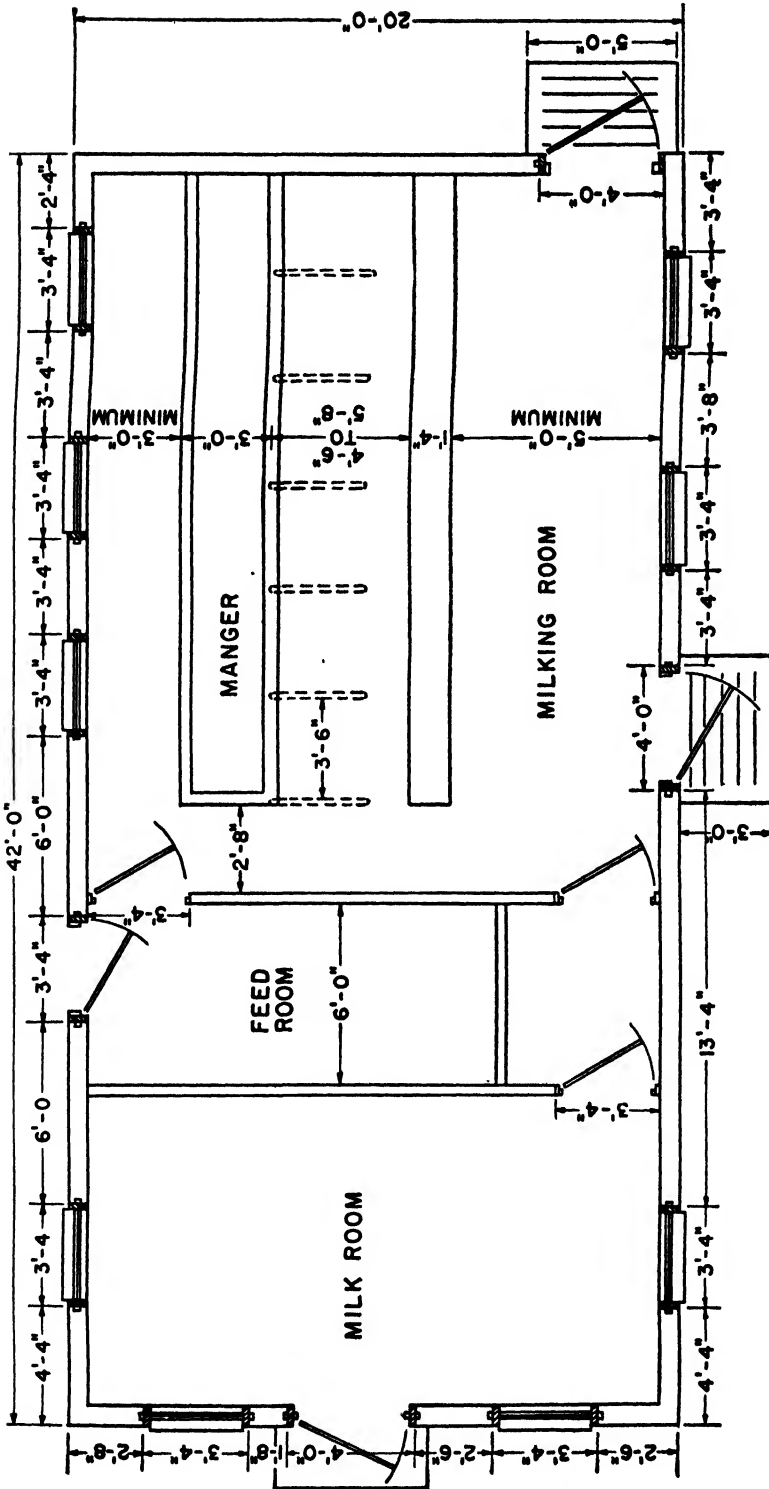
A floor plan for a combination milk room and milking barn.
